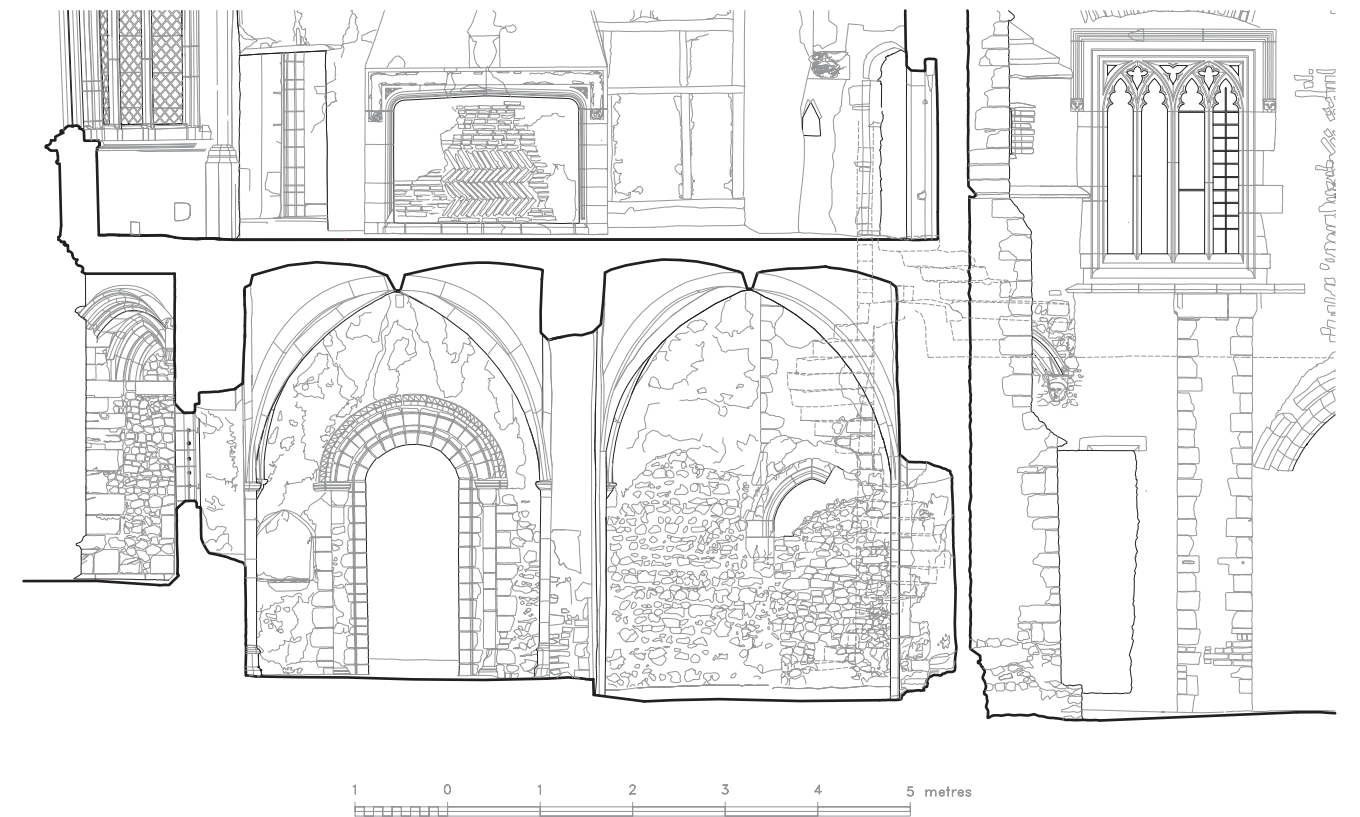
Section and sectional elevation, top left; profile or section, bottom left; sectional elevation, bottom; sectional elevation with hidden detail shown by dashed line.
